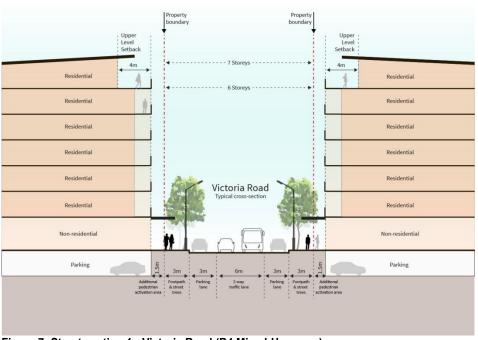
Street section 1 - Victoria Road (B4 Mixed-Use zone)
